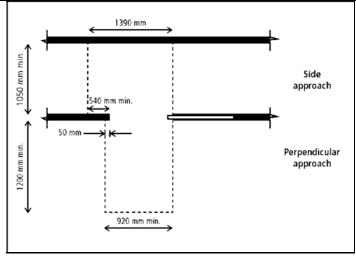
C Clear floor surfaces Sliding door
